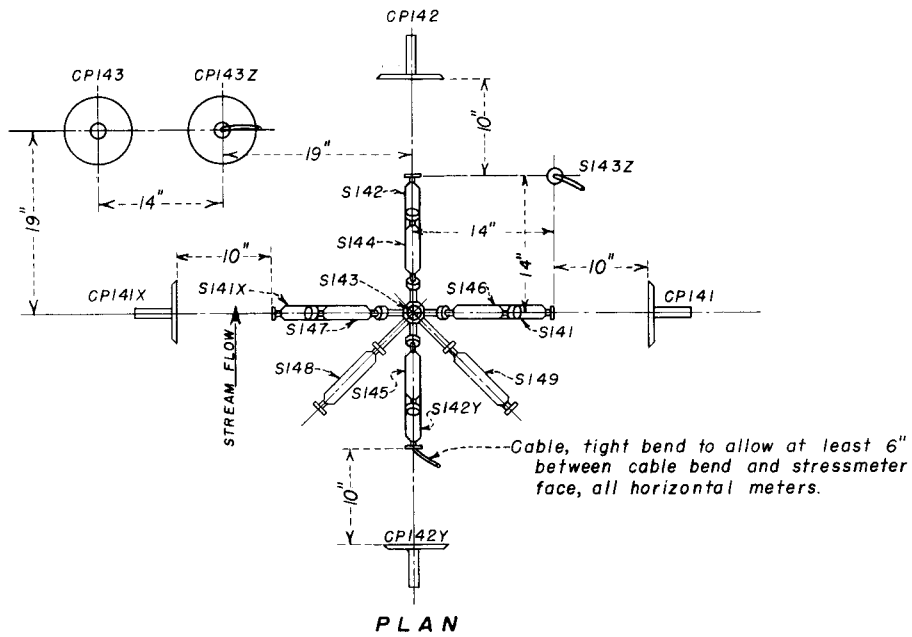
Layout of structural behavior instruments in dam—Reading station and conduit details.
